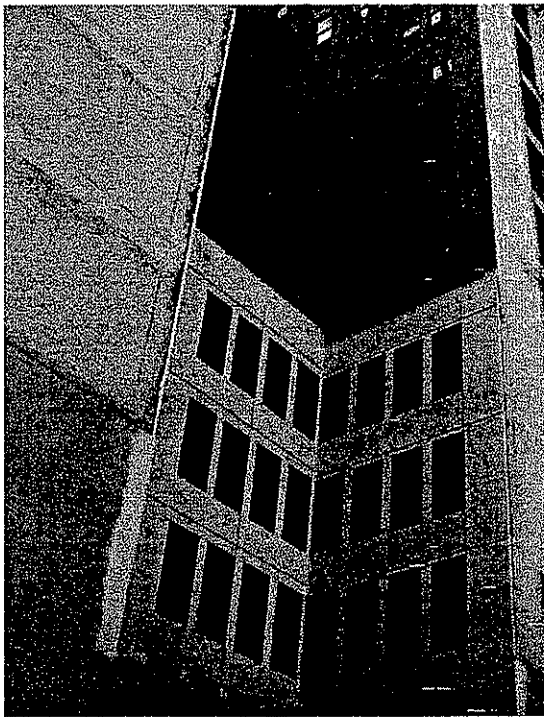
Exterior of new units constructed as infill within light well area. Floors 2,3,4,5. This additional space allowed for functional units on these floors. All sides were stuccoed for consistency of appearance. New windows are steel frame, double-hung 1/1 sash of similar form and design to similar windows in stories above.
